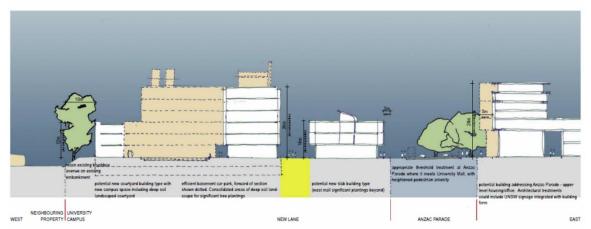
Cross Section 2-2 through Anzac Parade and the site (Source: RDCP)
